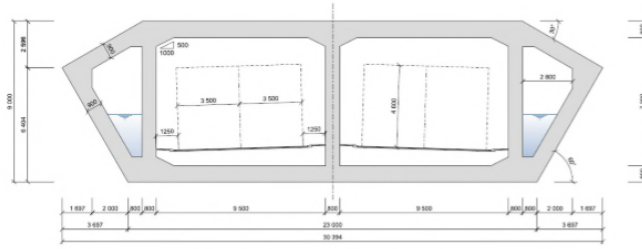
Cross section of submerged tunnel; provided by Reinertsen AS
